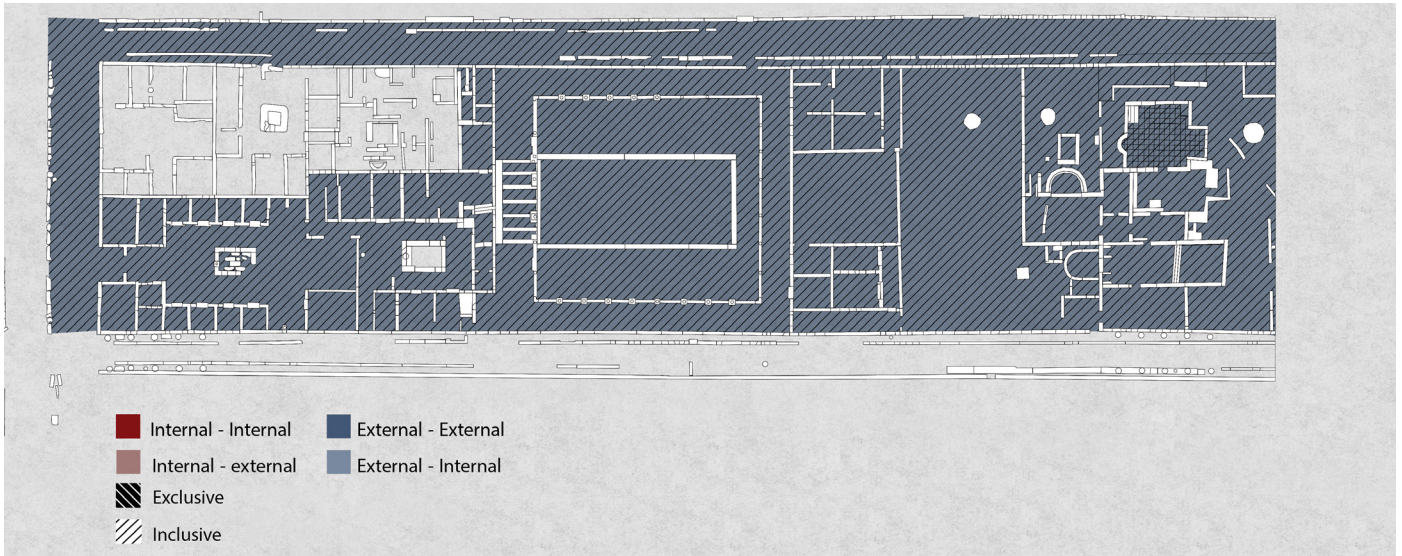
Proposed plan of Roman house with pool, with reconstruction of essential elements in volumetric approach.
